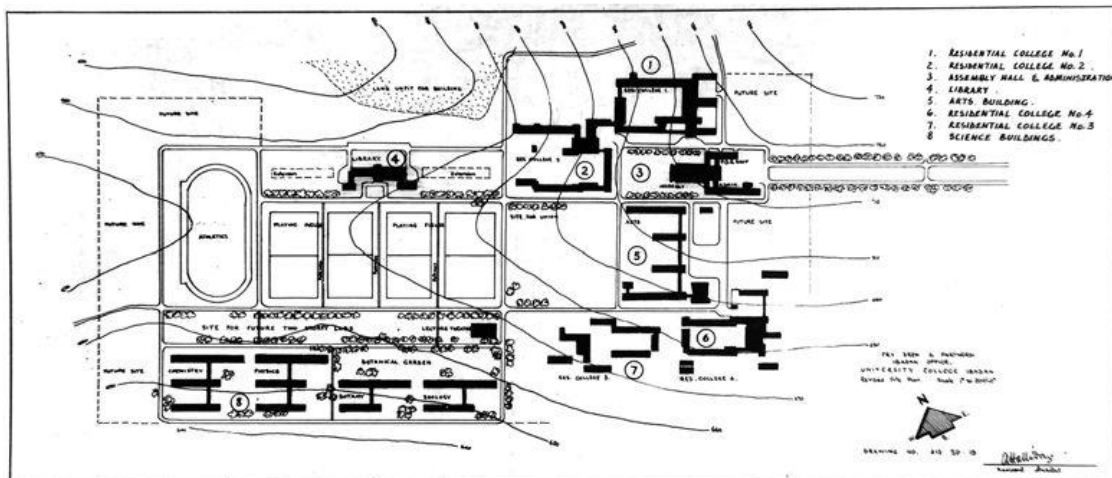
Ibadan University plan (Source: JACKSON; HOLLAND, 2014: 188).
